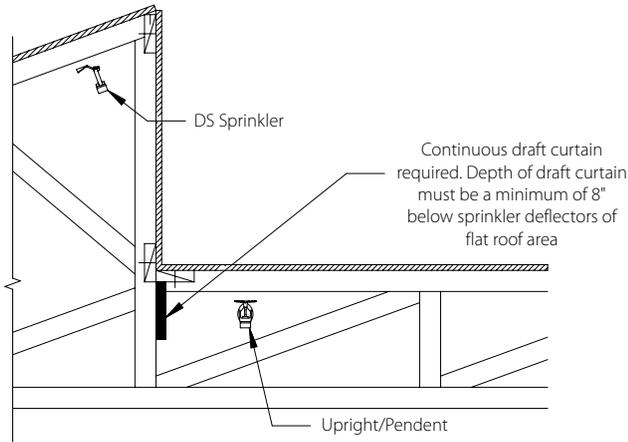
A: SLOPE TO FLAT TRANSITION WITH FLAT ROOF LOWER THAN PEAK OF SLOPED ROOF
